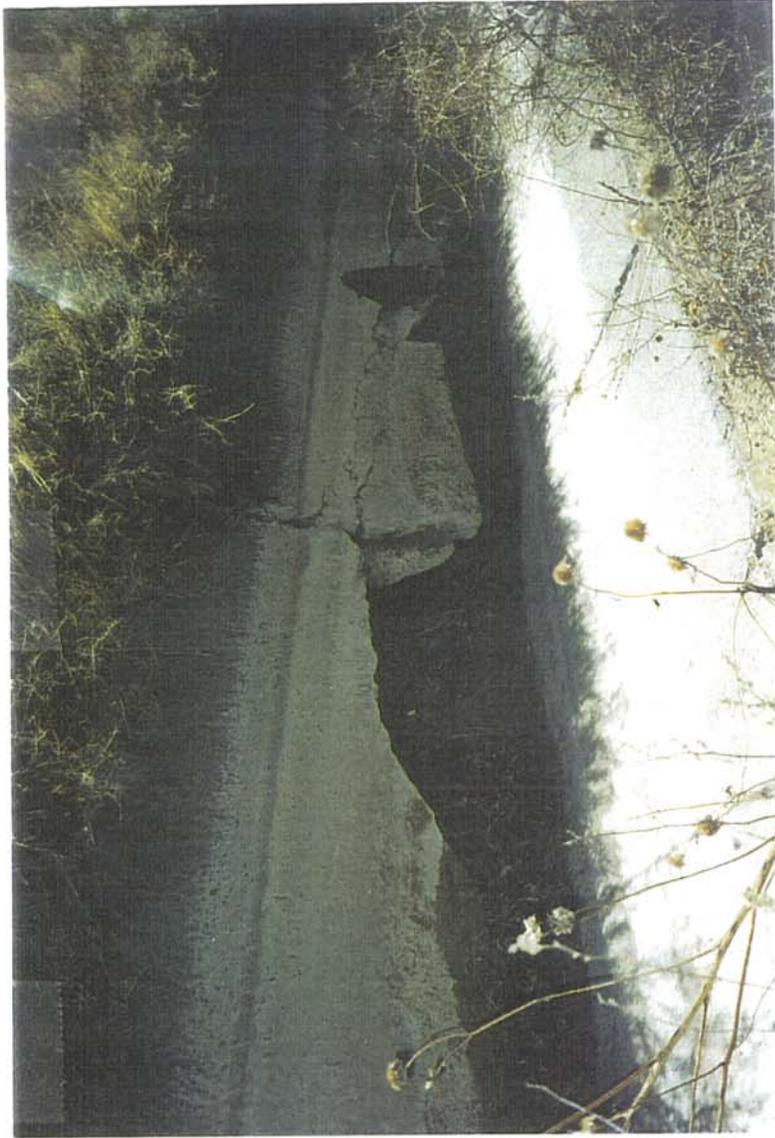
Typical deteriorated concrete ditch with broken floor and sidewall.
